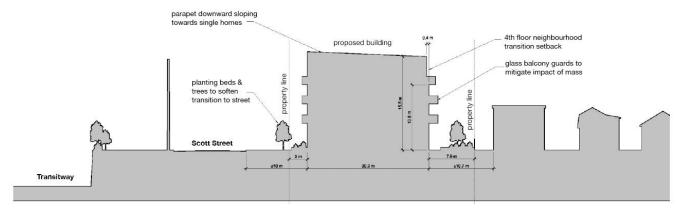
Streetscape cross section showing transition. Rendering provided by Open Plan Architects Inc.
